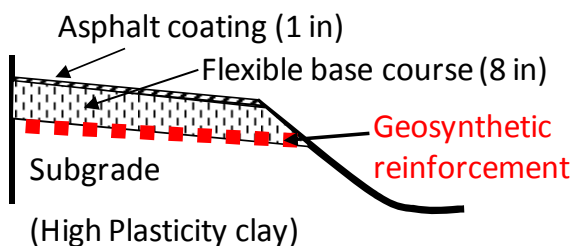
Typical pavement cross-section of a low-volume road in central Texas using reinforcement for mitigation of cracks induced by expansive subgrades.
